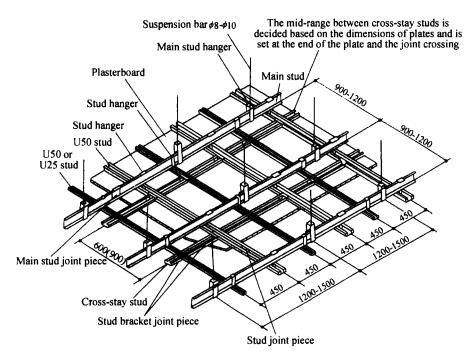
Structure Drawing of U-shape Galvanized Steel Stud and Thistle Board Suspended Ceiling
